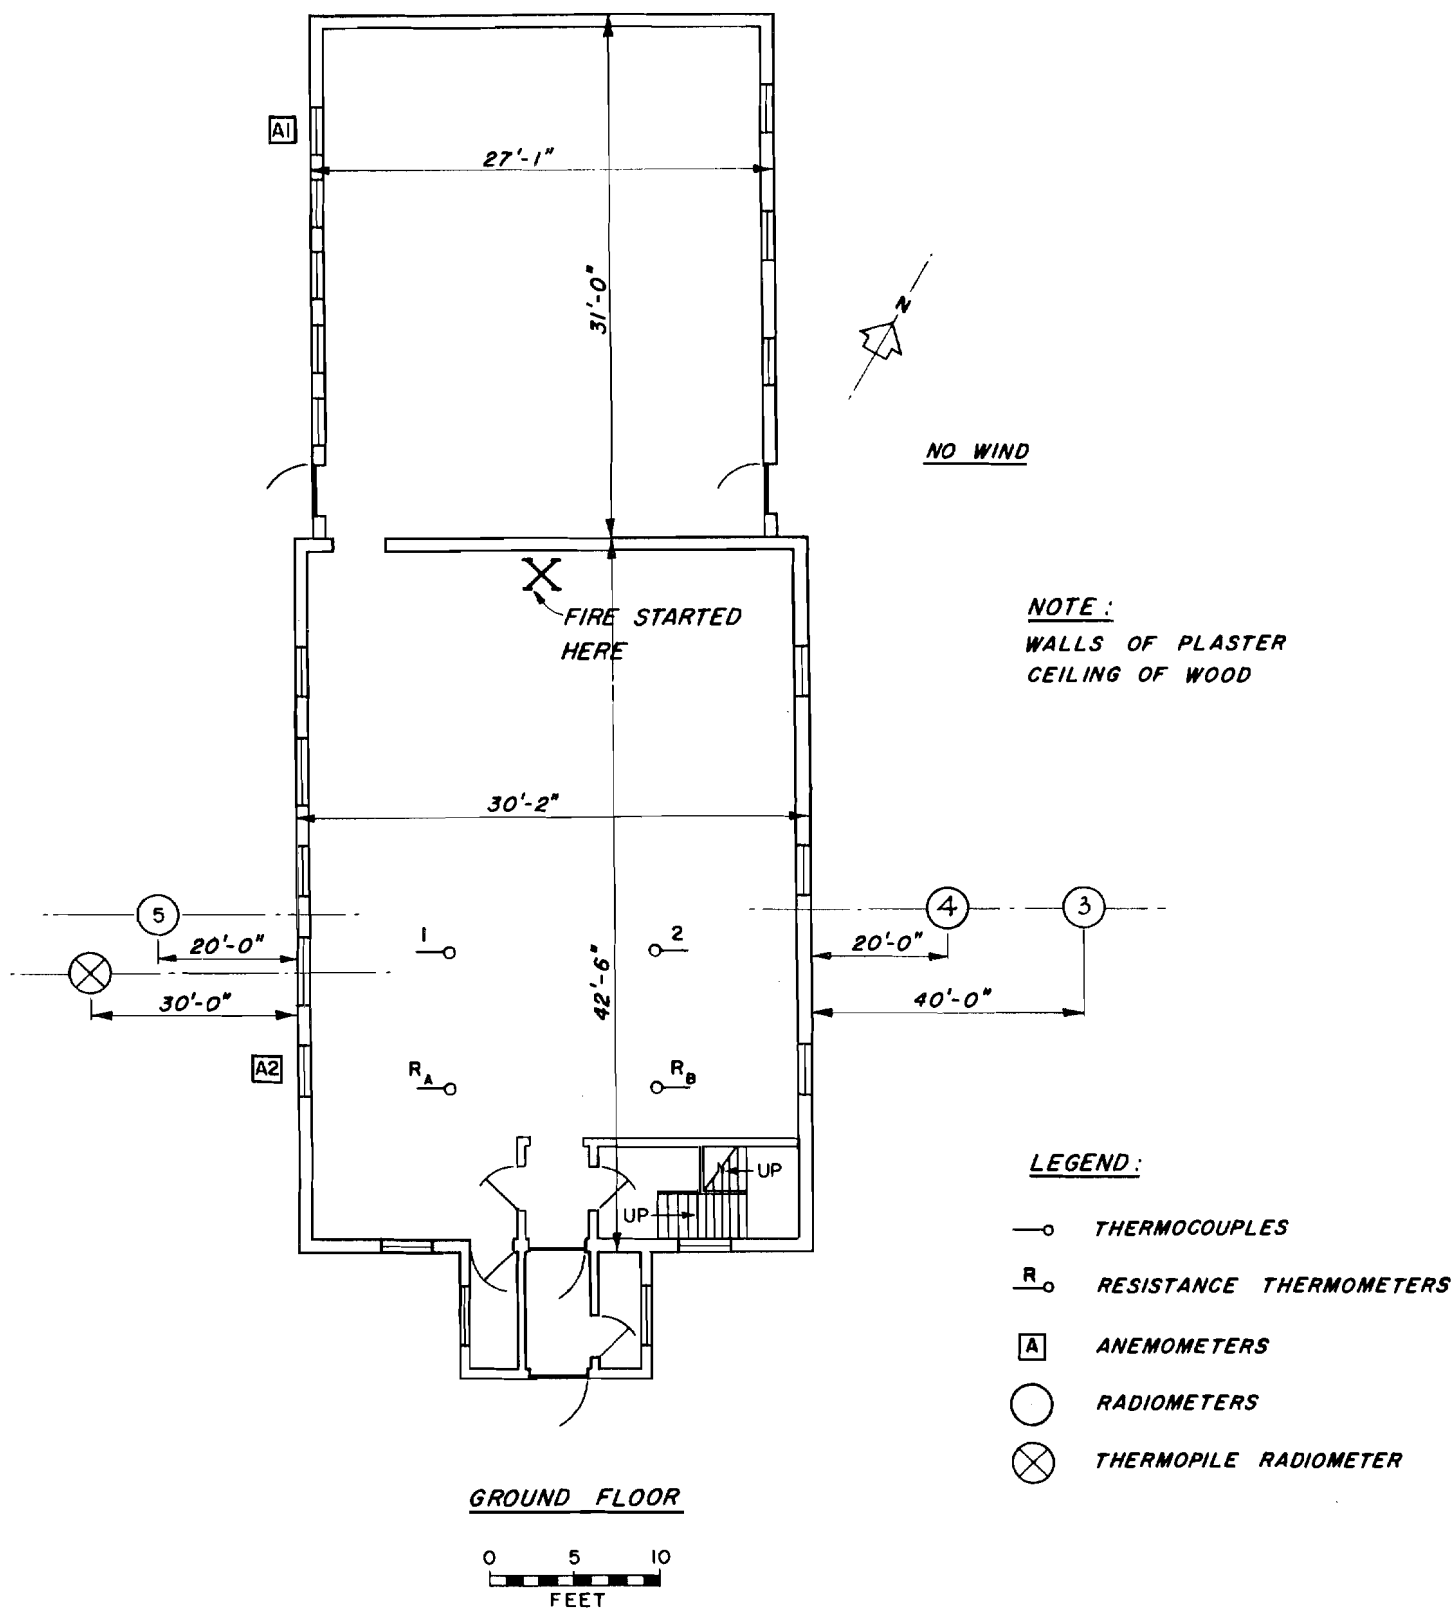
BUILDING No. 8 - TWO - STOREY SOLID BRICK SCHOOL WITH ONE - STOREY EXTENSION AT REAR
